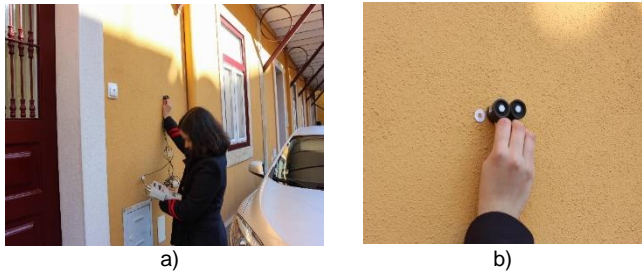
Placement of the pyranometer on the vertical plane of the façade of one of the buildings: a) sensor on the wall; b) detail of the sensor on the wall.
